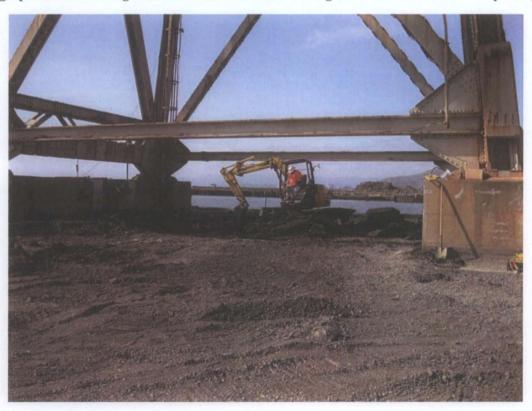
Gamma scanning along trench segment 06-D28-32-1J in WA 28—April 1, 2011
